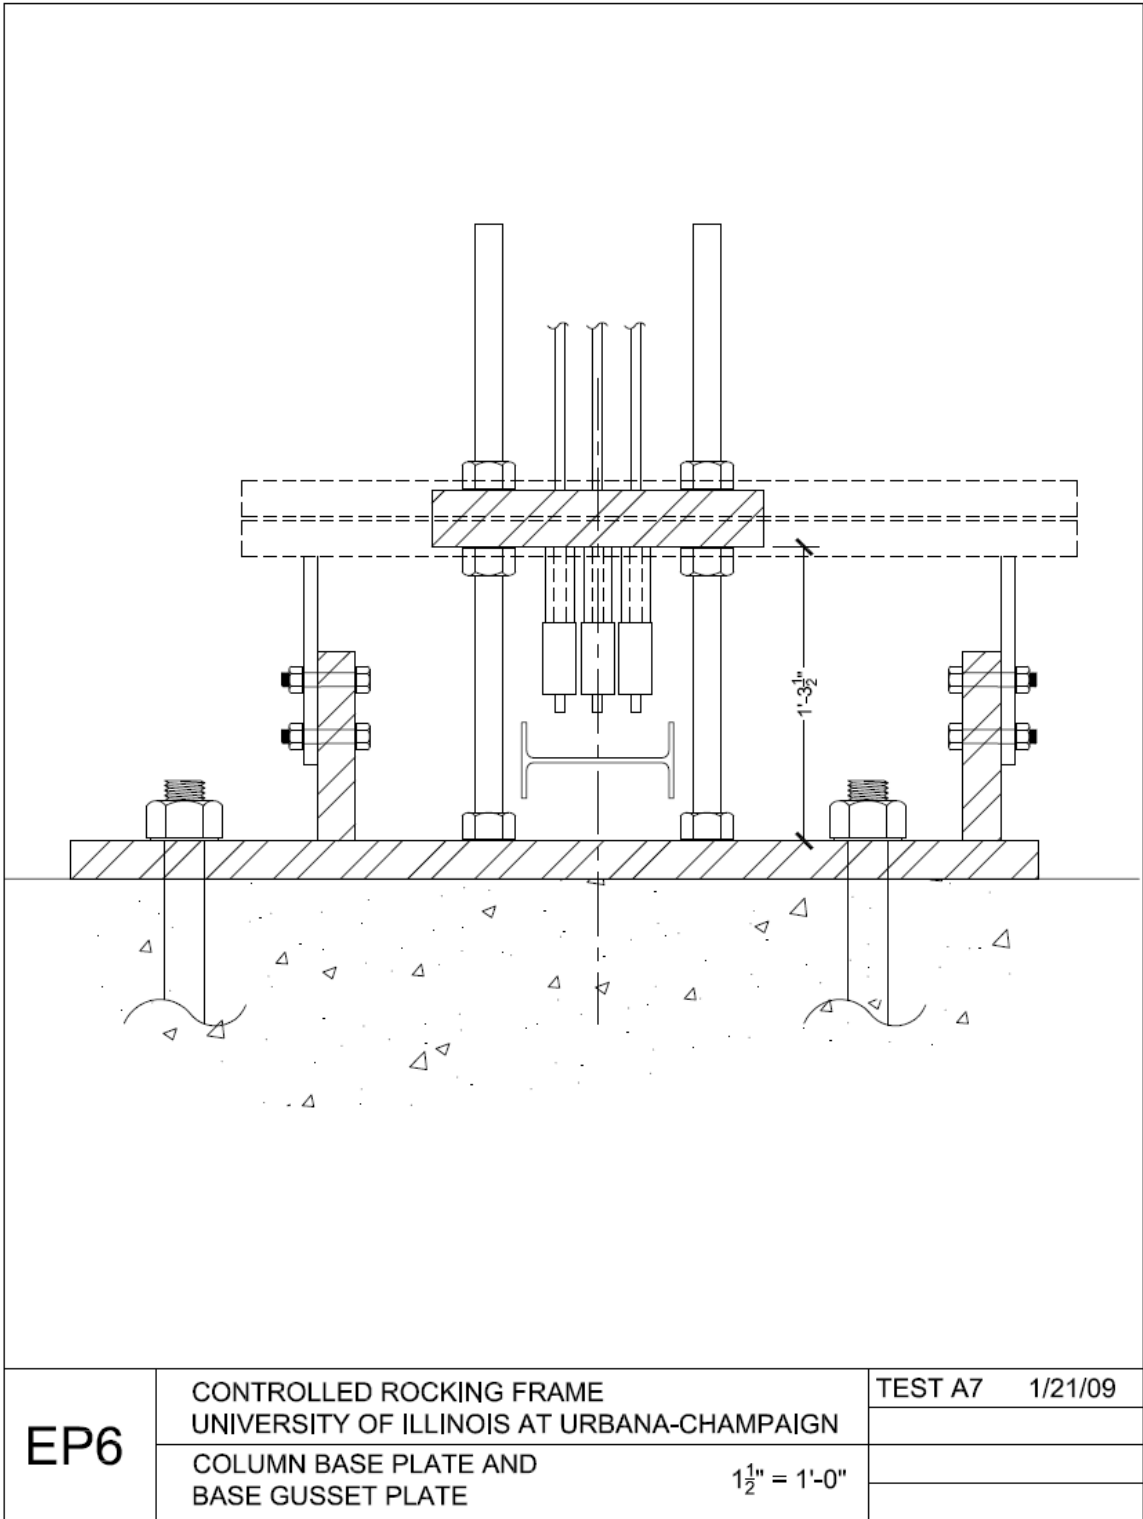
Erection Plan Drawing – Lower Post-Tensioning Anchorage
